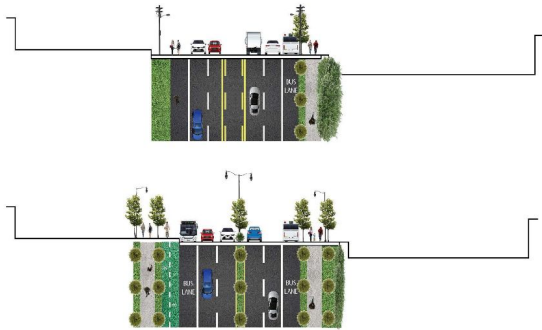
Plan view and section of current conditions with a street redesign along Aurora / 130th
